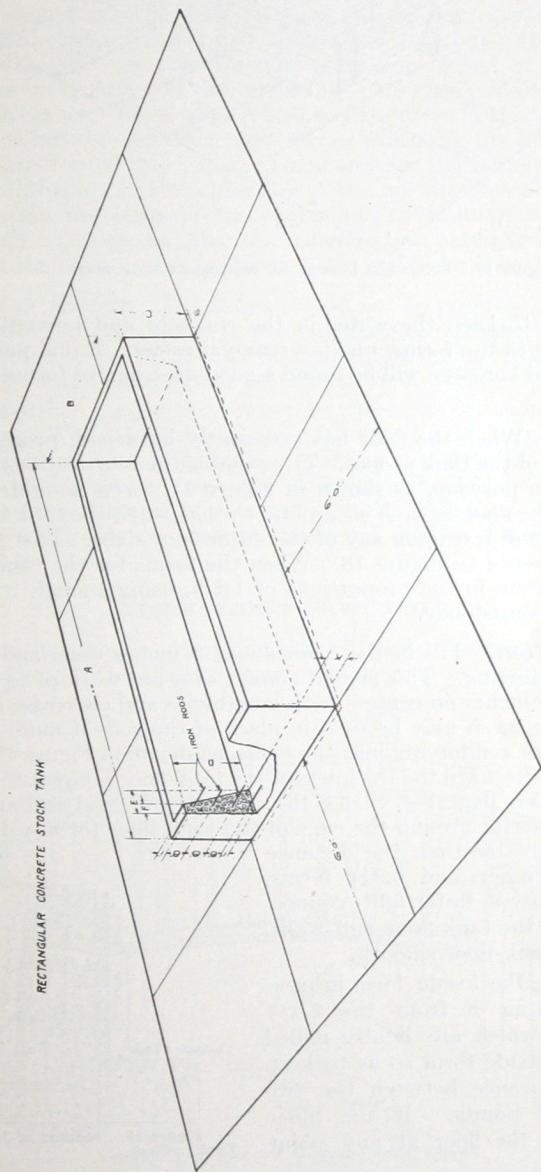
Layout for a Rectangular Stock Tank with surrounding floor.
